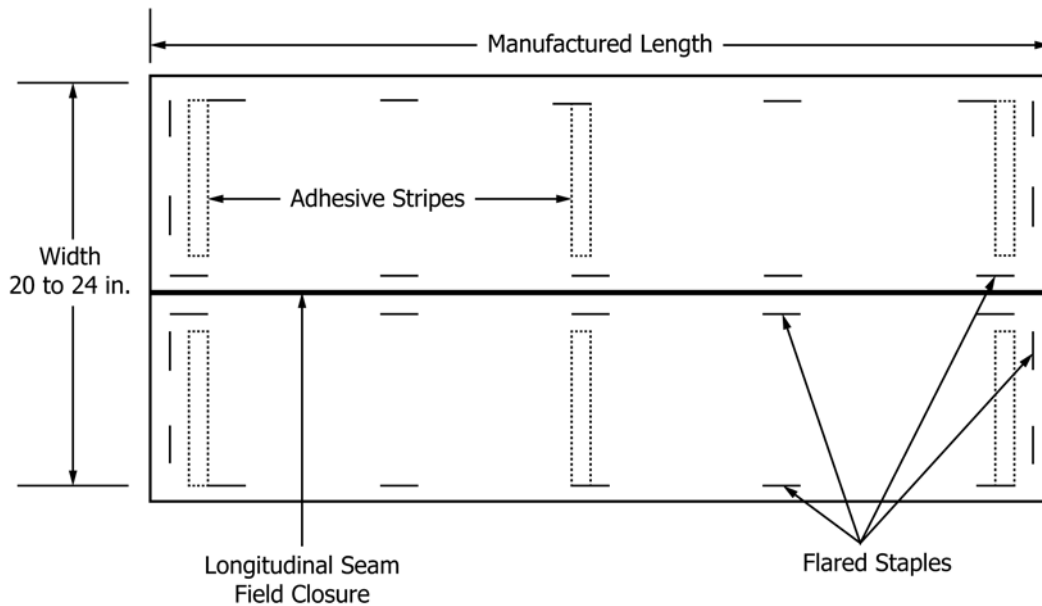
Insulation and Jacket with Transverse Adhesive Stripes (see 6.1.6.1)
